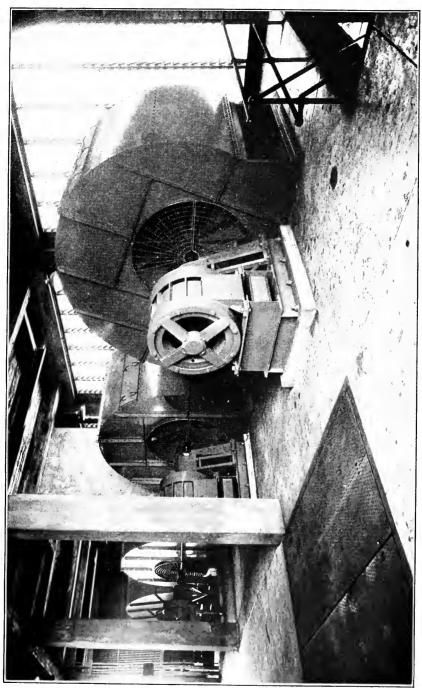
PLATE V.—SOME OF THE INTAKE FANS LOCATED IN THE EAST BOSTON VENTILATION BUILDING.
